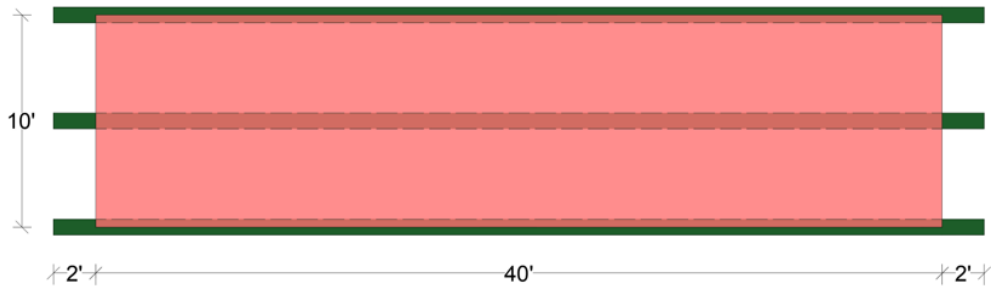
Plan layout of a typical 10 ft x 40 ft single FastFloor module. The distance between the supports is 40 ft.
